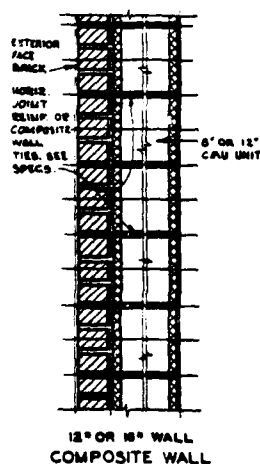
Modular Masonry Coursing, Composite and Cavity Walls (Ref 4b)
